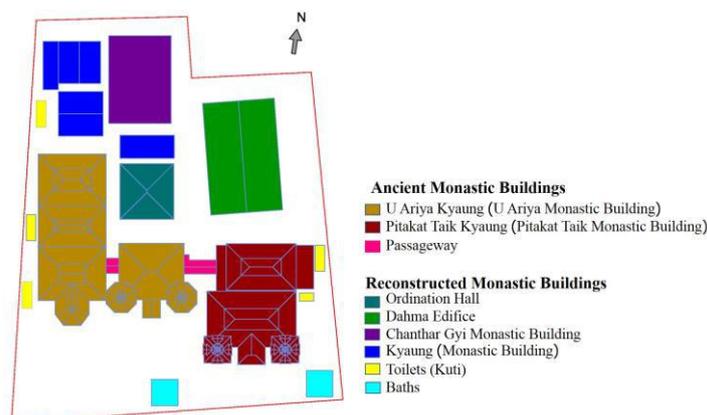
Site Layout Plan of U Ariya Monastery Compound
